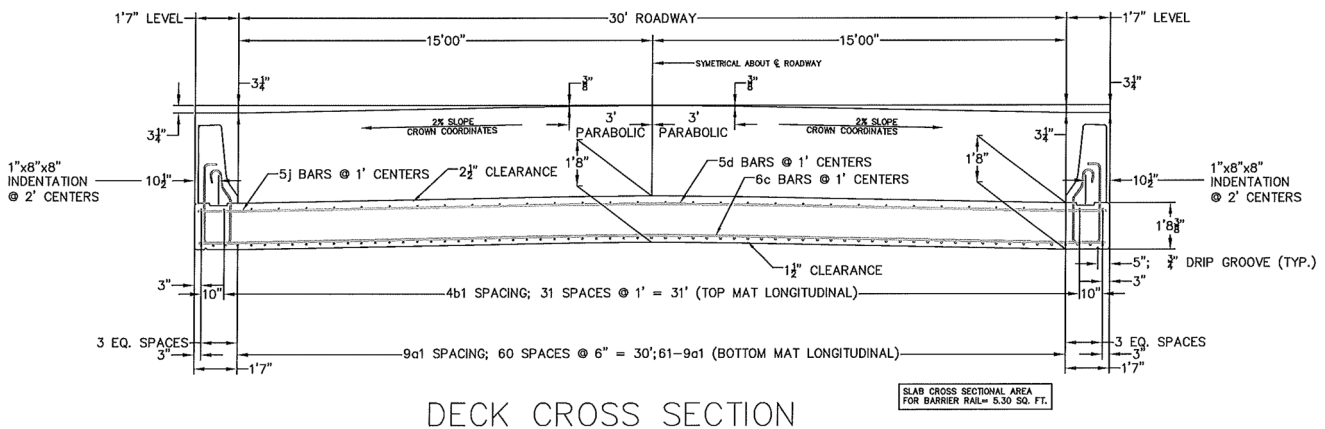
Dubuque County SSCS bridge transverse section (L-B-18(02)—73-31)
